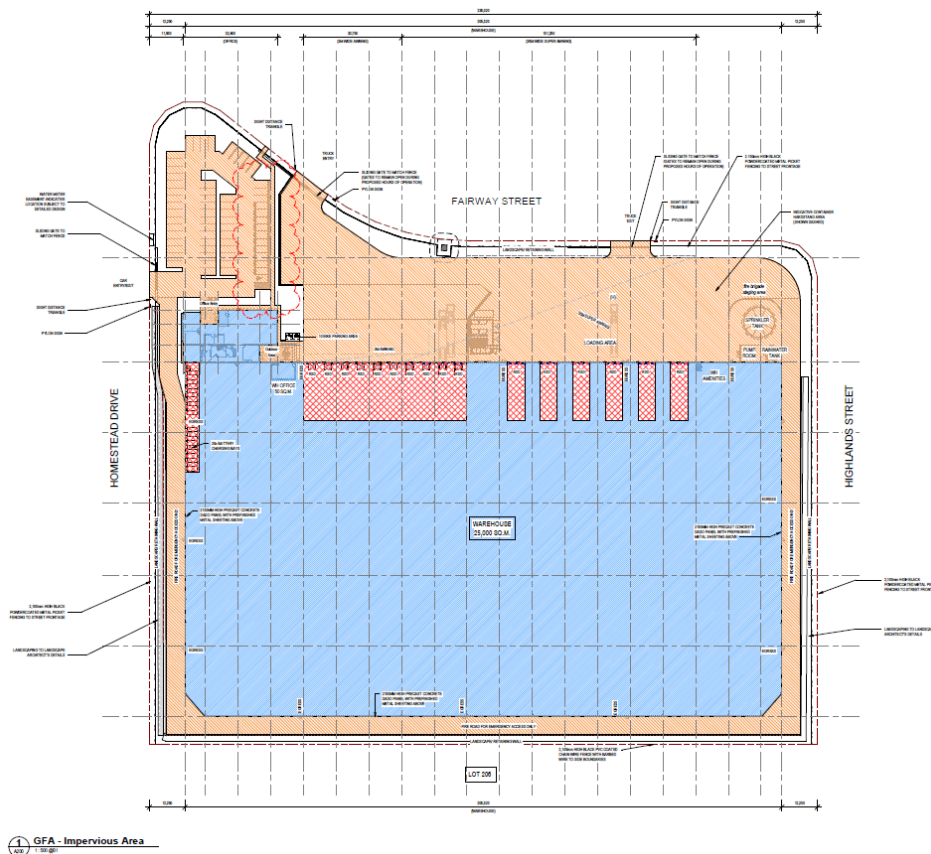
Proposed changes to loading bays and addition of battery charging area (Source: HLA architects)
